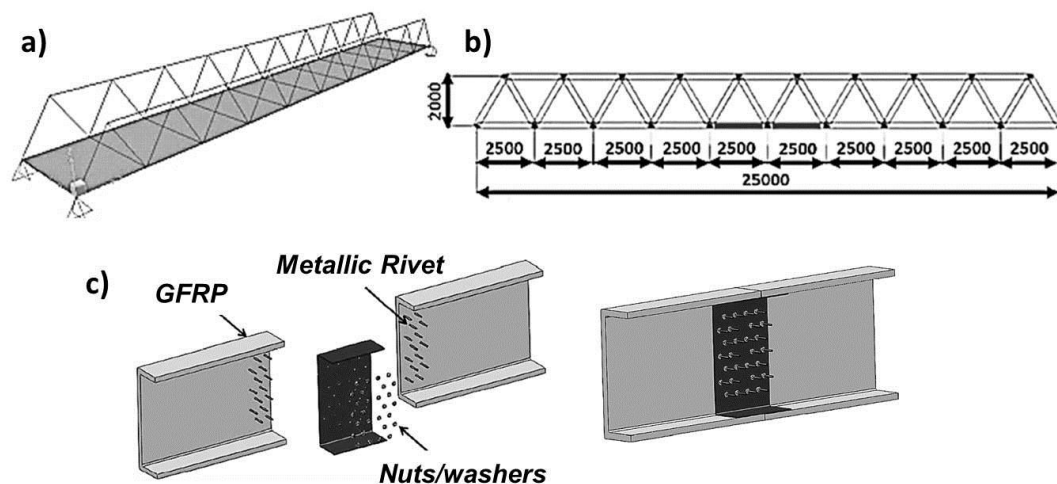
3 a) Isometric view of the GF-PEI truss bridge proposed by Blaga *et al.*; b) static model of the bridge; c) schematically view of the assembly on GFRP/metallic rivet/metallic gusset friction-riveted joints used in the structural truss bridge model (Adapted from [43]).
